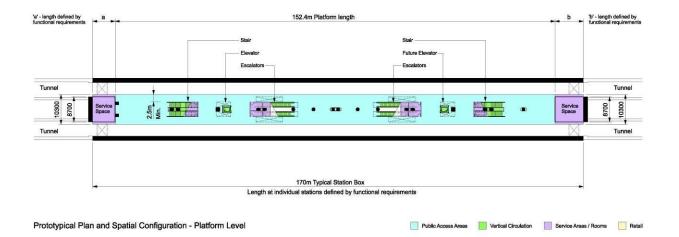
Prototypical Plan and Spatial Configuration - Platform Level
